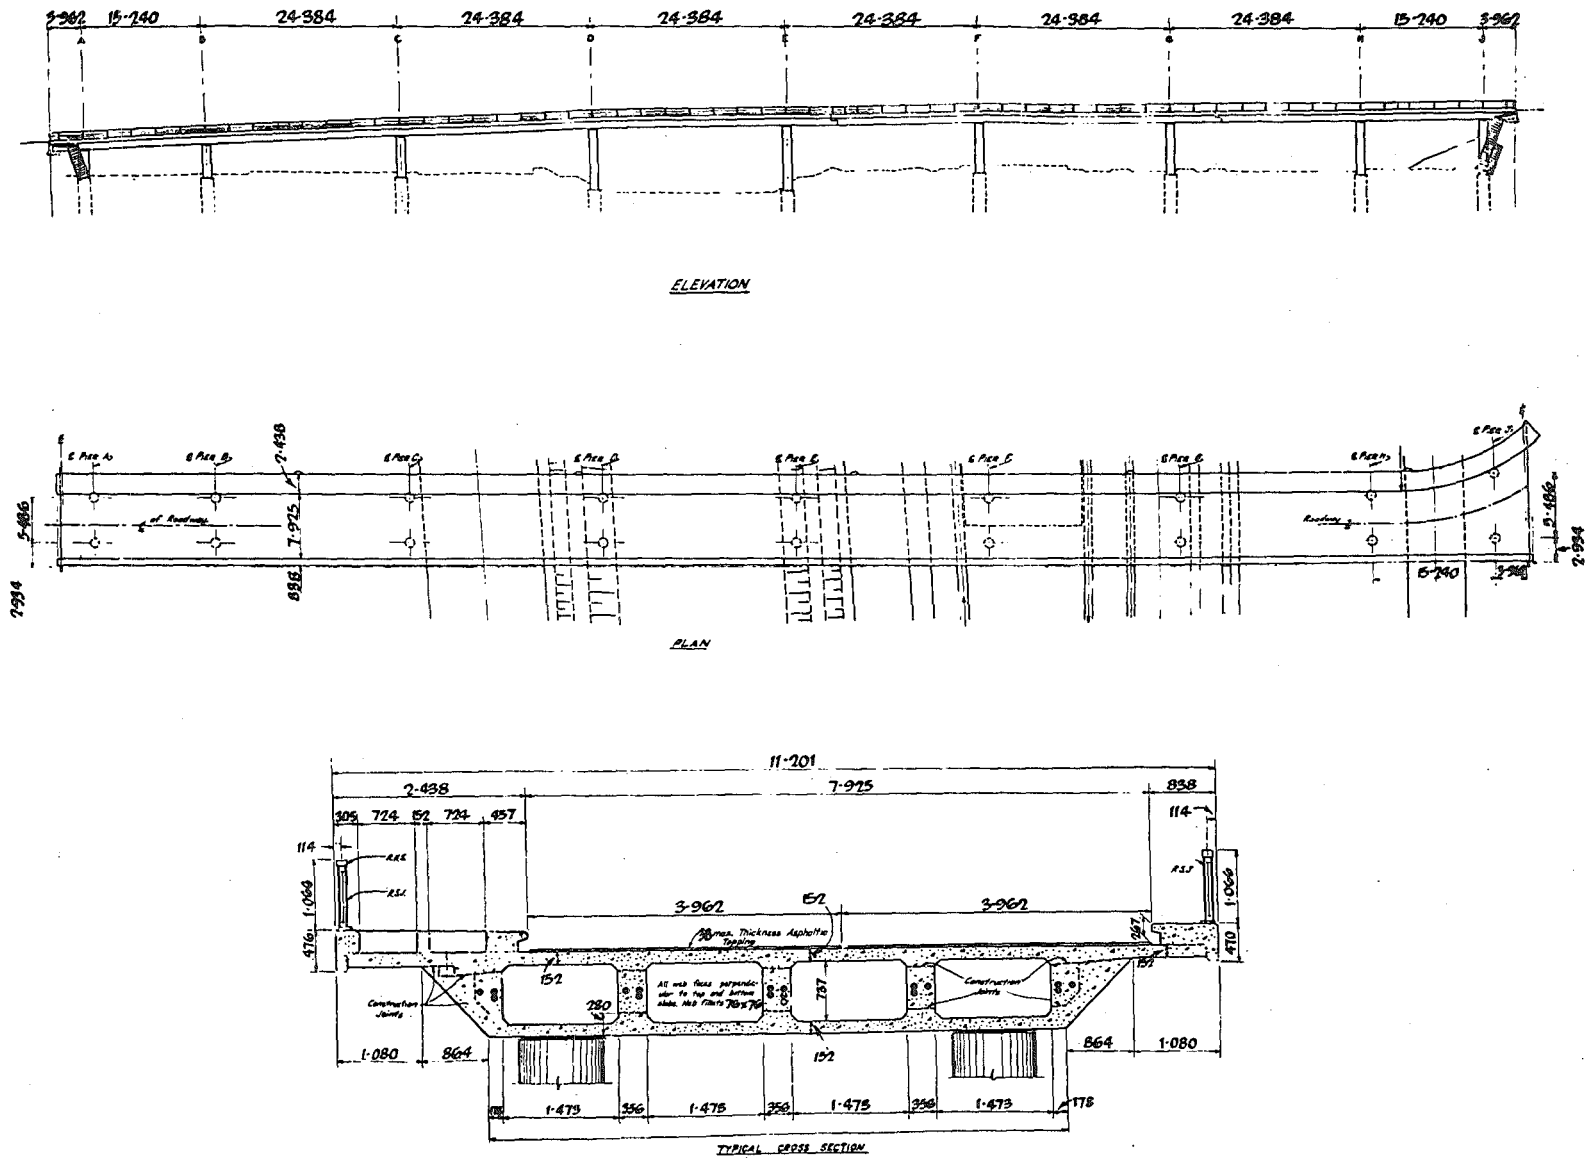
STRUCTURAL DIMENSIONS OF PORIRUA STATION OVERBRIDGE
